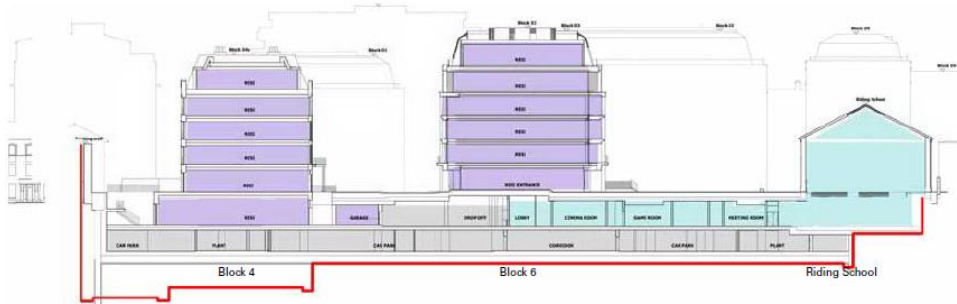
Section AA The Amended Proposed Development with the Consented Development profile shown in red
